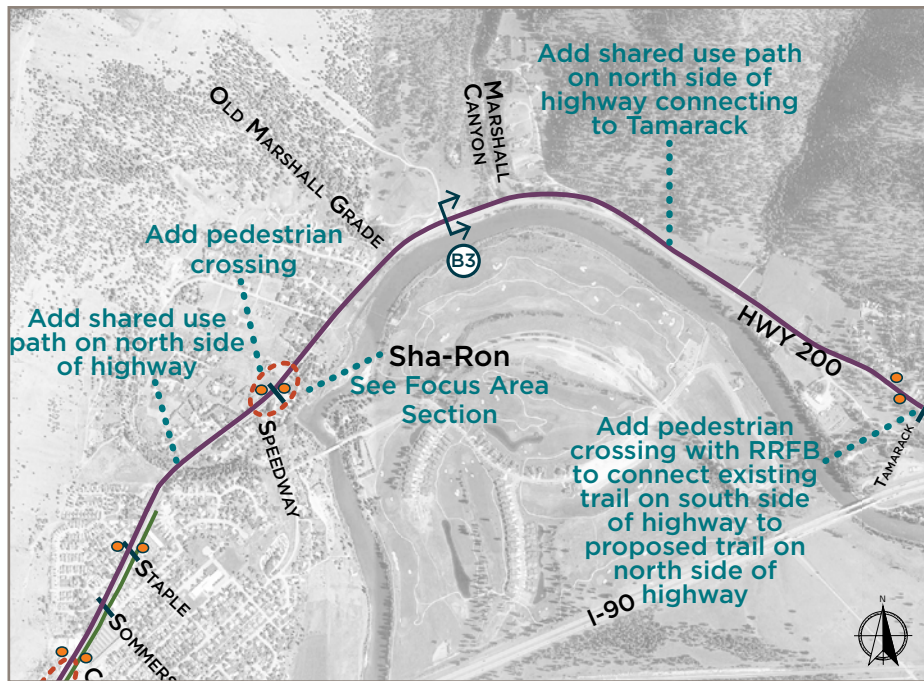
Alternative B Plan - Sha-Ron/Marshall Segment
